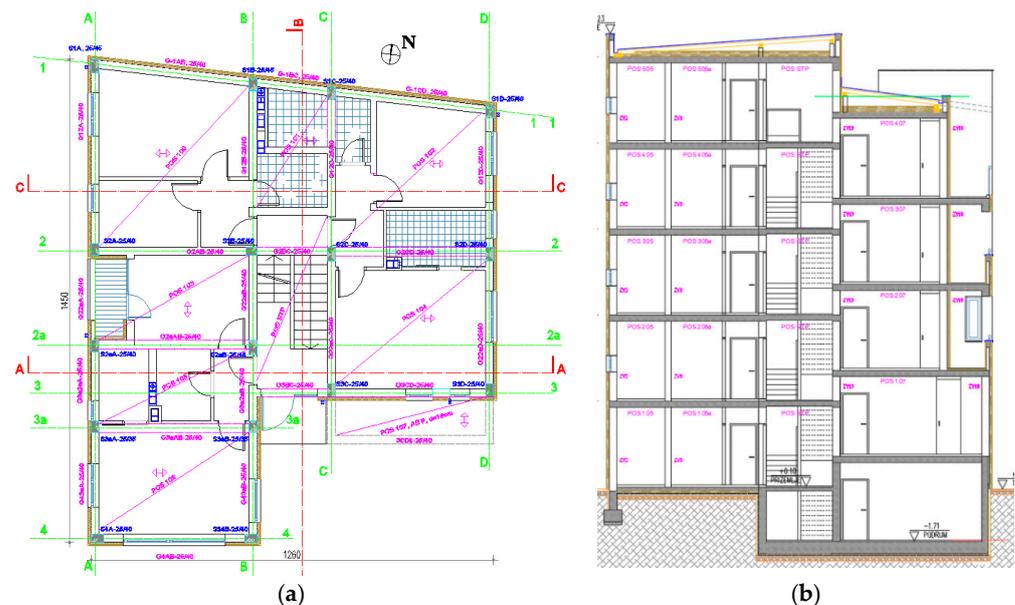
Case study building—RC-frame solution: (a) plan at the ground-floor level and (b) vertical section A–A. (This is RC frame structure. Letters and signs in blue color: RC columns of RC frame structure; magenta color: RC beams of RC frame structure and floors).
